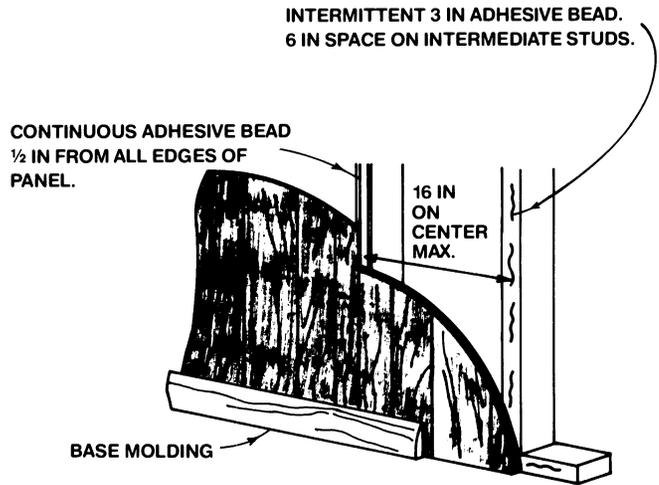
Application of wall paneling to open framing; studs spaced 16 in on center (Masonite Corp.).
